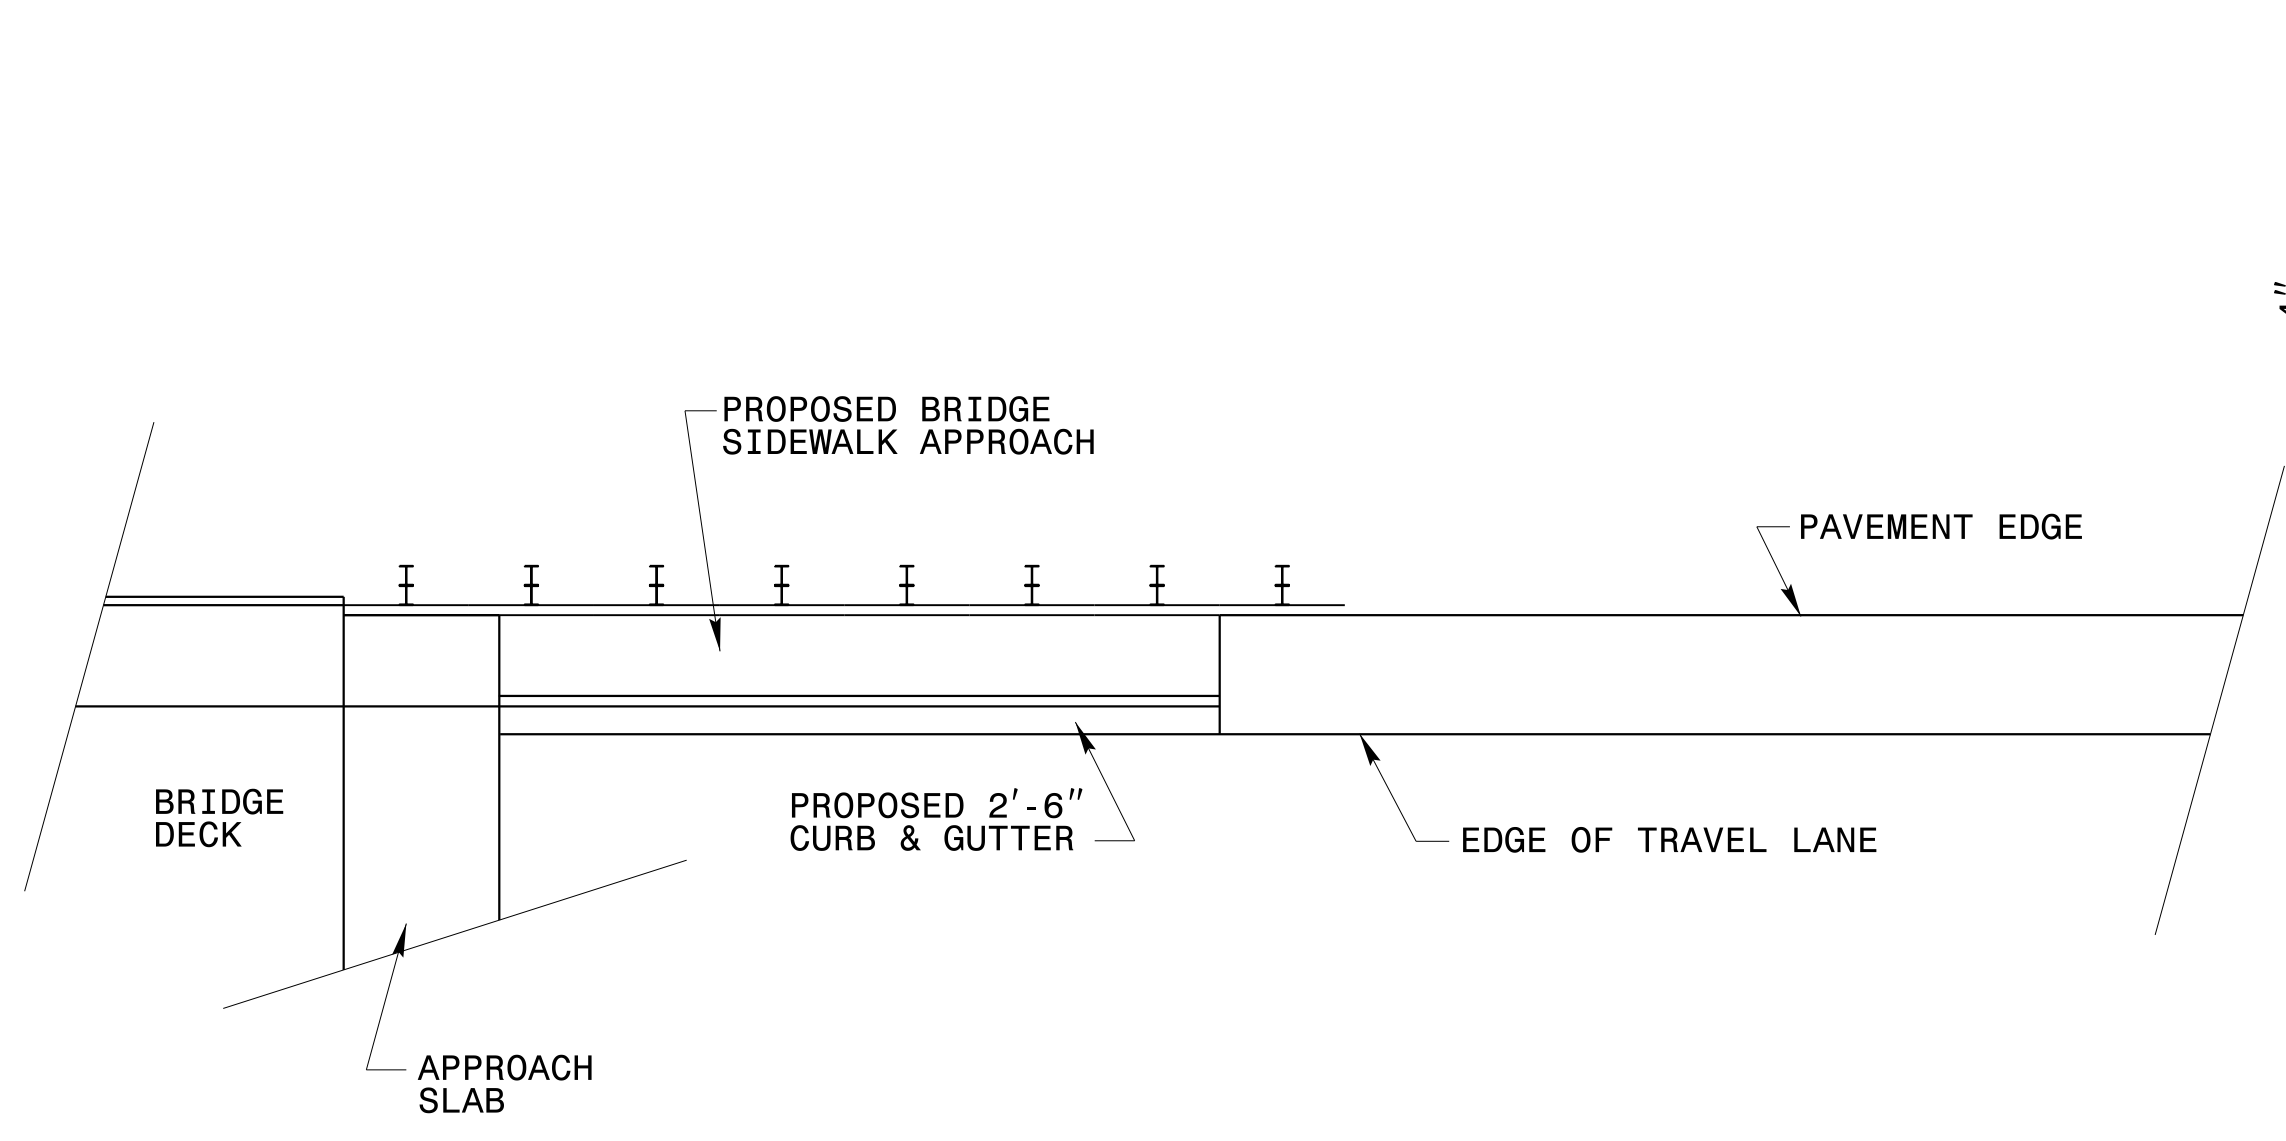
DETAIL OF PROPOSED CONCRETE BRIDGE SIDEWALK APPROACH
